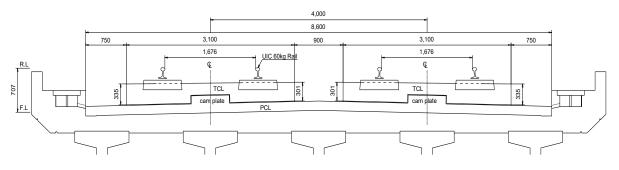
Cross-section of Ballasted Double Track on Elevated
